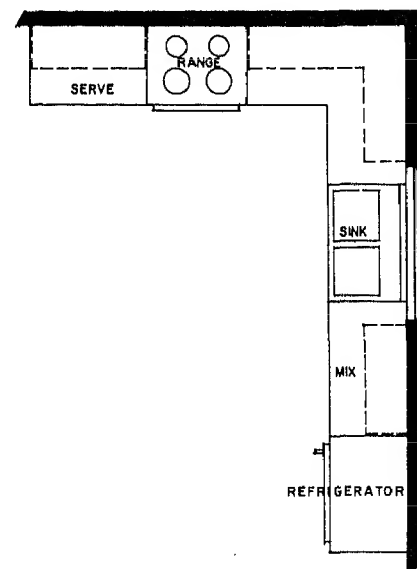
L-shaped plan. If dishwasher is desired, it should be located at sink center.
